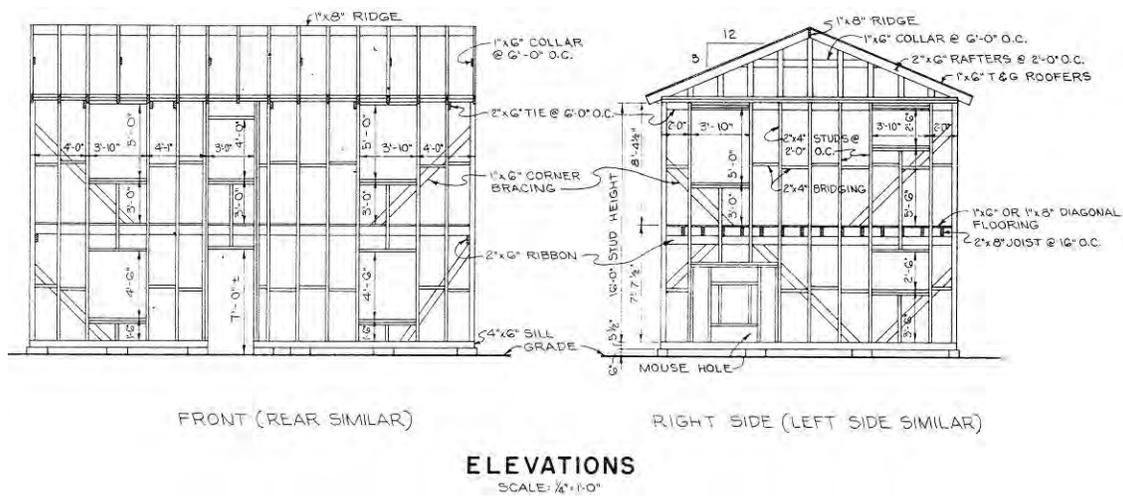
"Combat in cities" course type "B" building elevations, 1952 (standard drawing 28-13-01 sheet 4 of 9; "Combat in cities" course, type "B" building, plans, elevations, and details; 20 June 1952).
